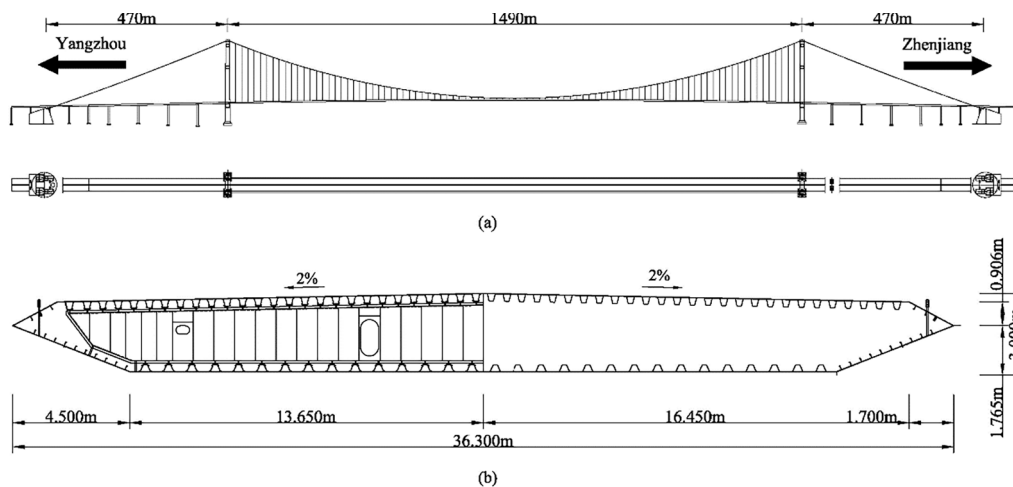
Configuration of Runyang suspension bridge: (a) bridge schematic; (b) cross section of steel box girder.
